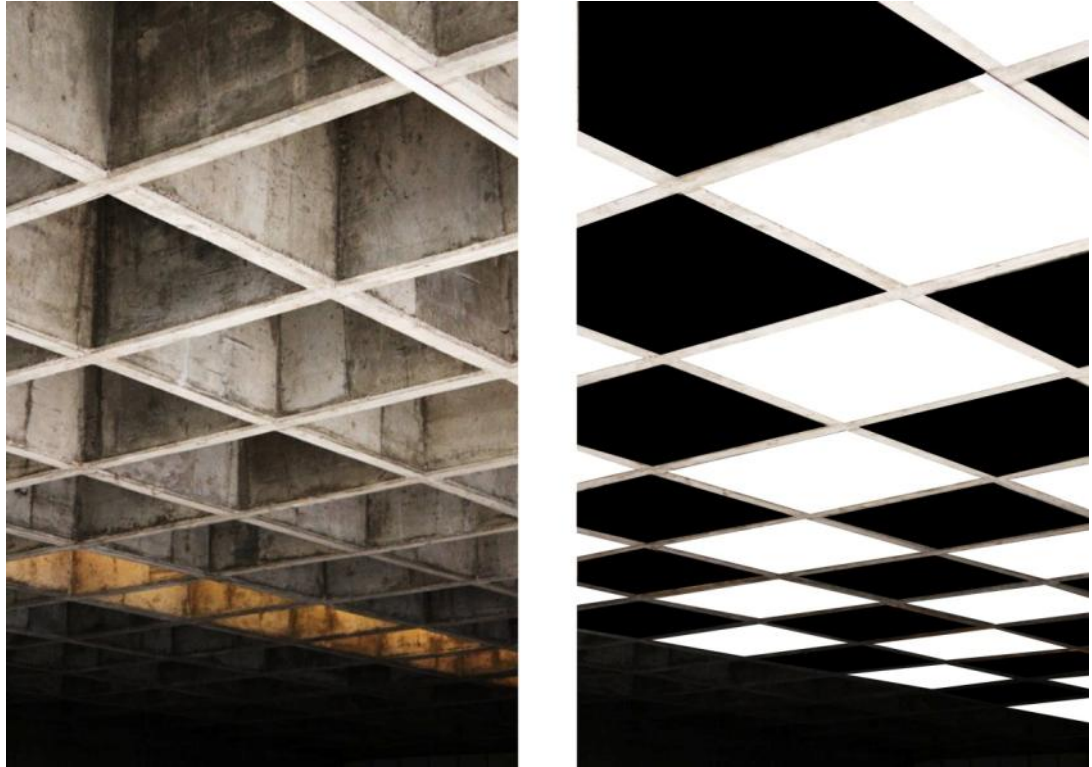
Waffle slab ceiling, METU Faculty of Architecture
